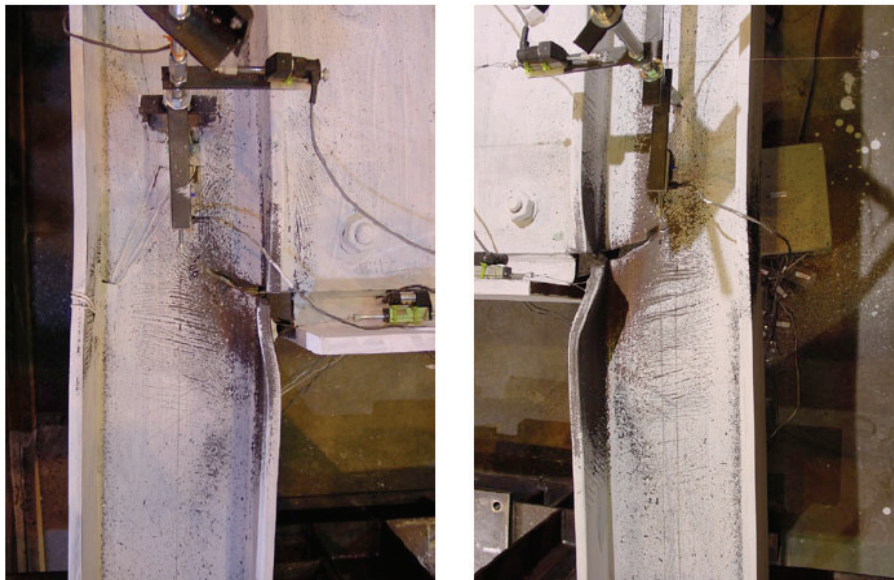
Fracture of Beam-to-Column Connection in a Two-Story CBF Specimen (Uriz, 2005).
